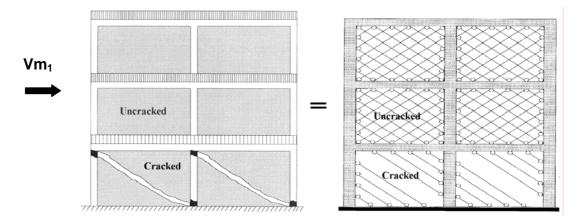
Model used to calculate the forces at the wall confinements in complex cases.
